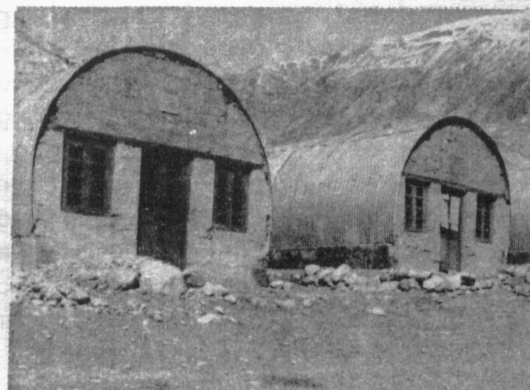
CYLINDRICAL SHEDS OF CORRUGATED IRON SHEETS WHICH SUFFERED NO DAMAGE EXCEPT DEVELOPMENT OF MINOR CRACKS ALONG SIDE WALLS
